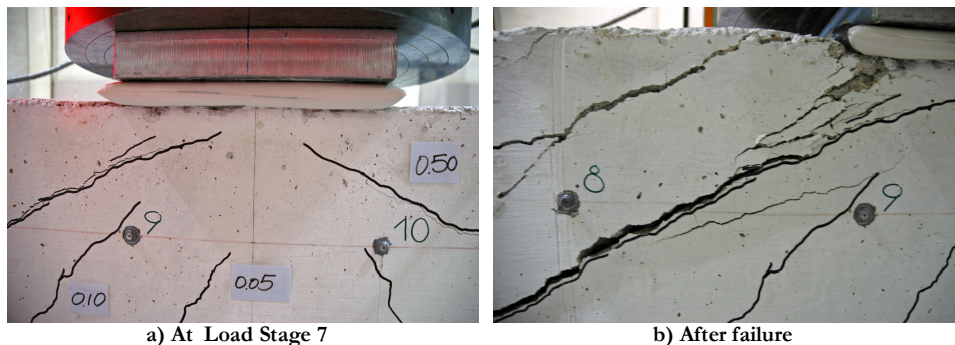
Crushing of concrete near loading plate – specimen L0M
